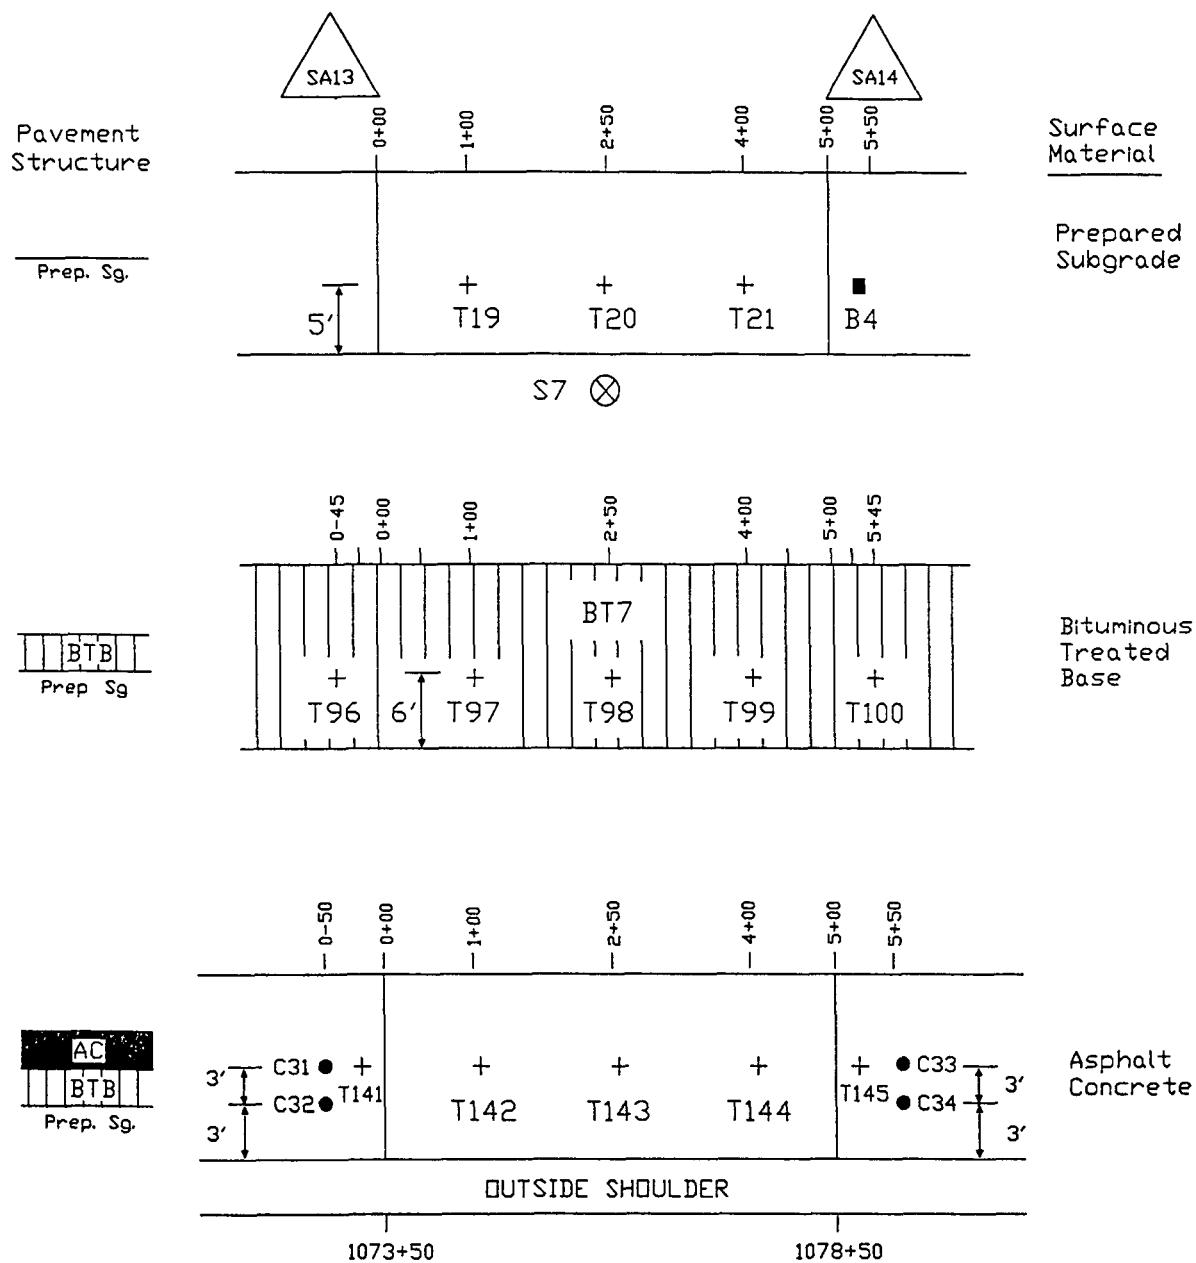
Sampling and test plan for test section 040119, SPS-1 Arizona.
